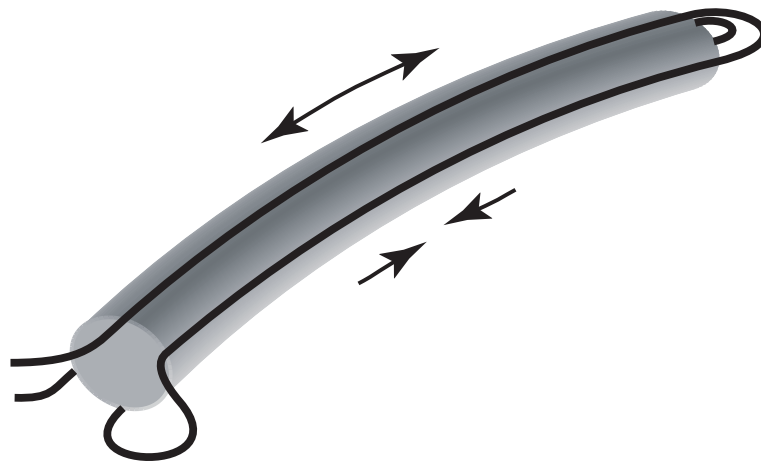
Schematic view of the smart reinforcing pipe used for strengthening the soil during excavation. The fibre is placed at the four cardinal points of the pipe section and experiences strain whatever the direction the pipe is deformed by soil movements.
